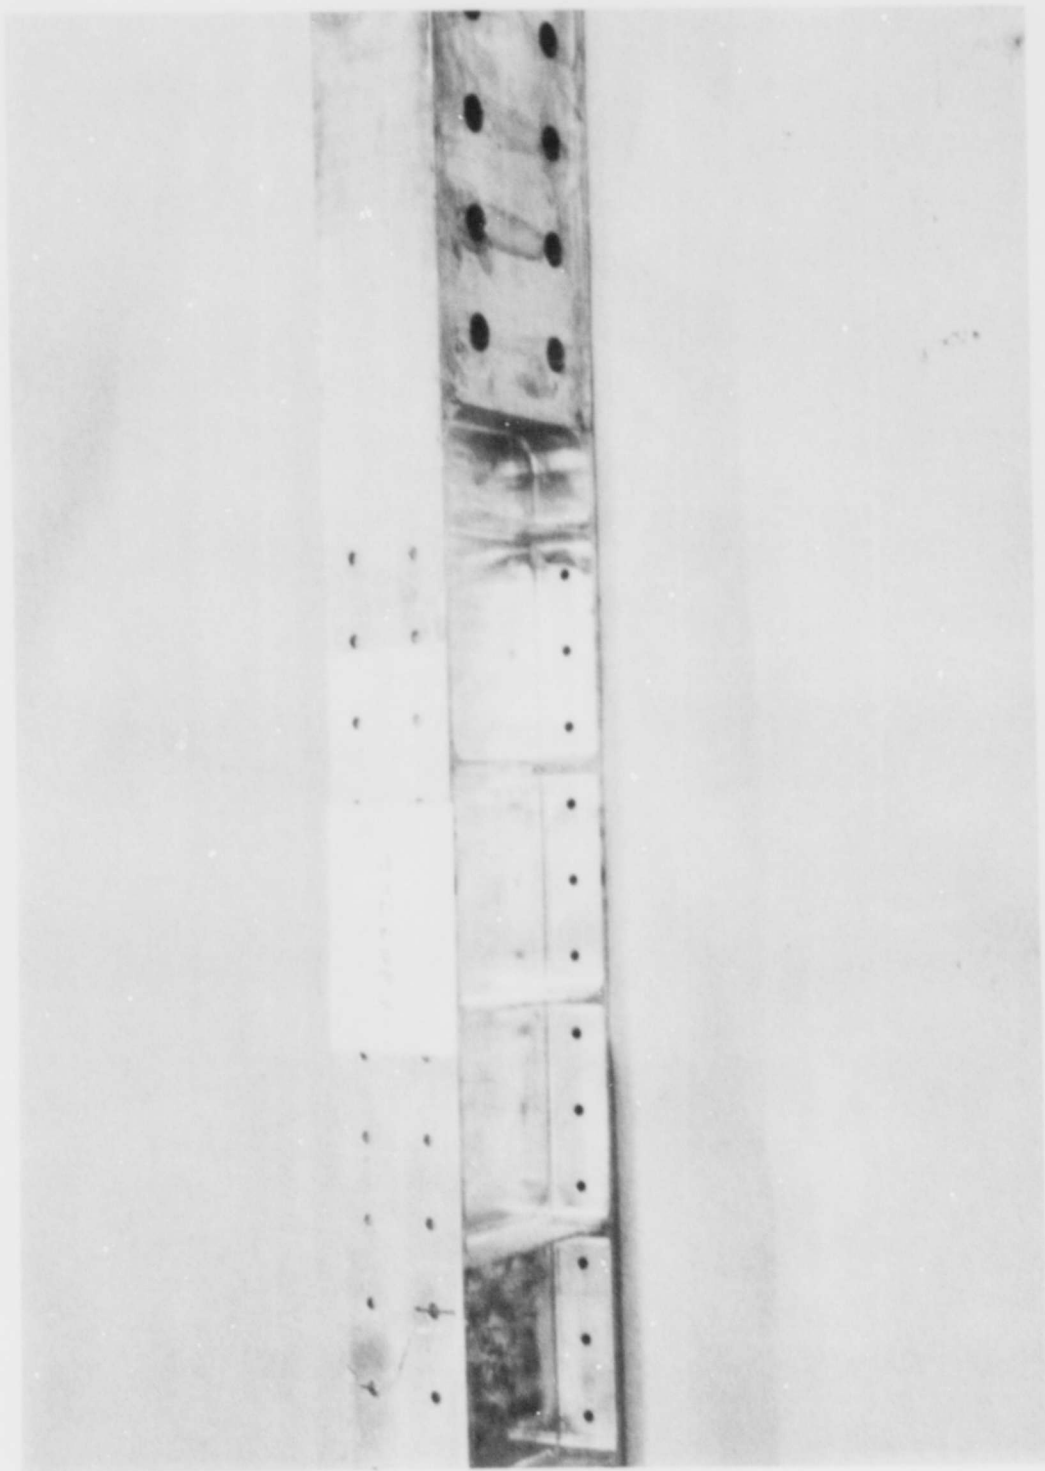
ALUMINUM I-BEAM FAILURE, WITH FASTENER HOLES, S/N F409766
